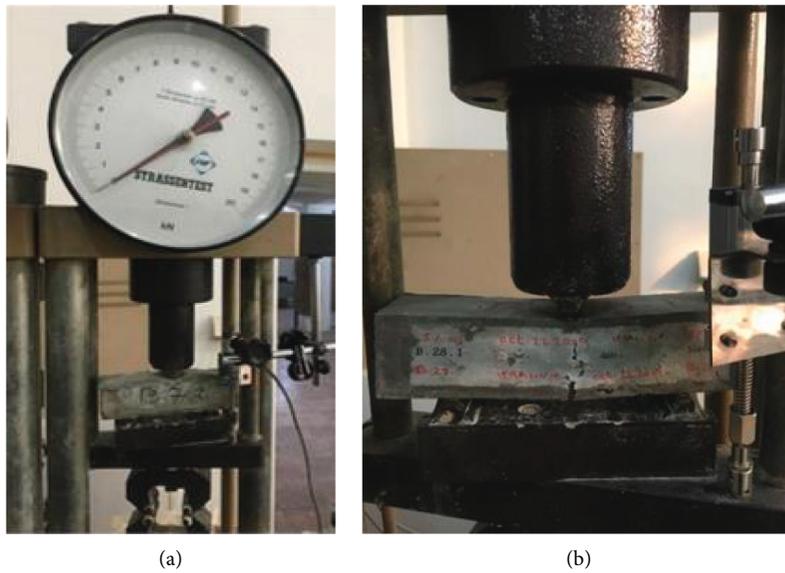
Flexural test: (a) test machine and (b) flexural specimen.
